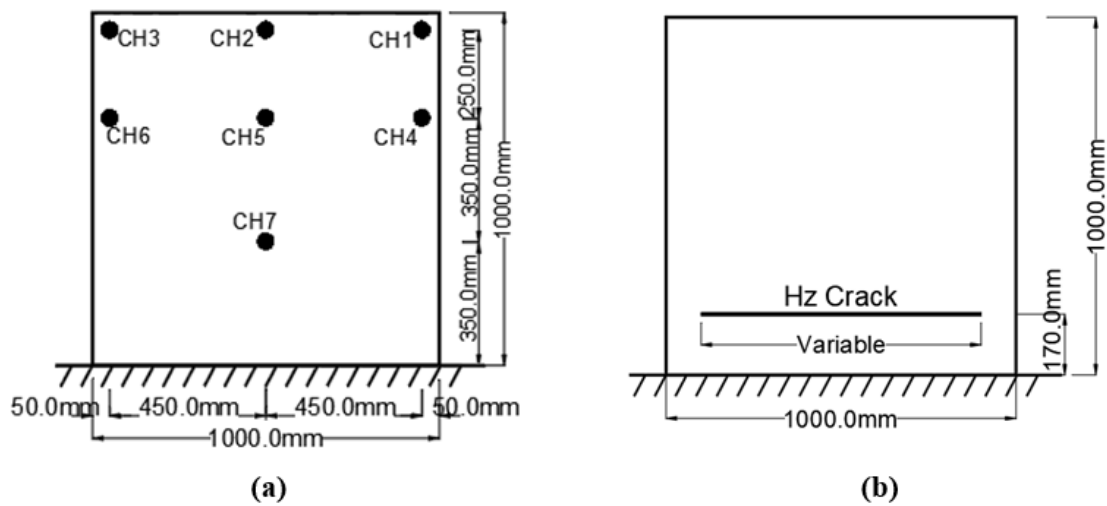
a) Schematic Showing Accelerometers Arrangement, and b) Horizontal Crack Pattern for Examined Specimens
